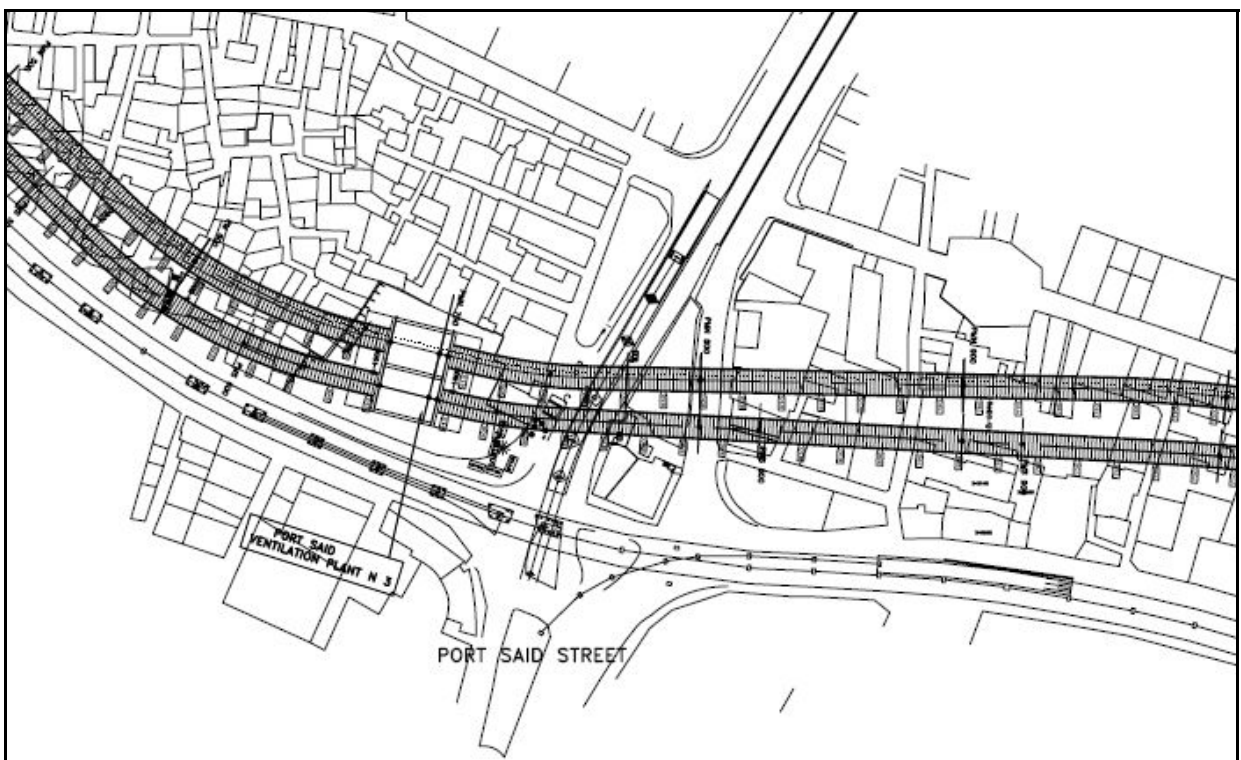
Plan of El Azhar Tunnel at intersection of Port Said Street
